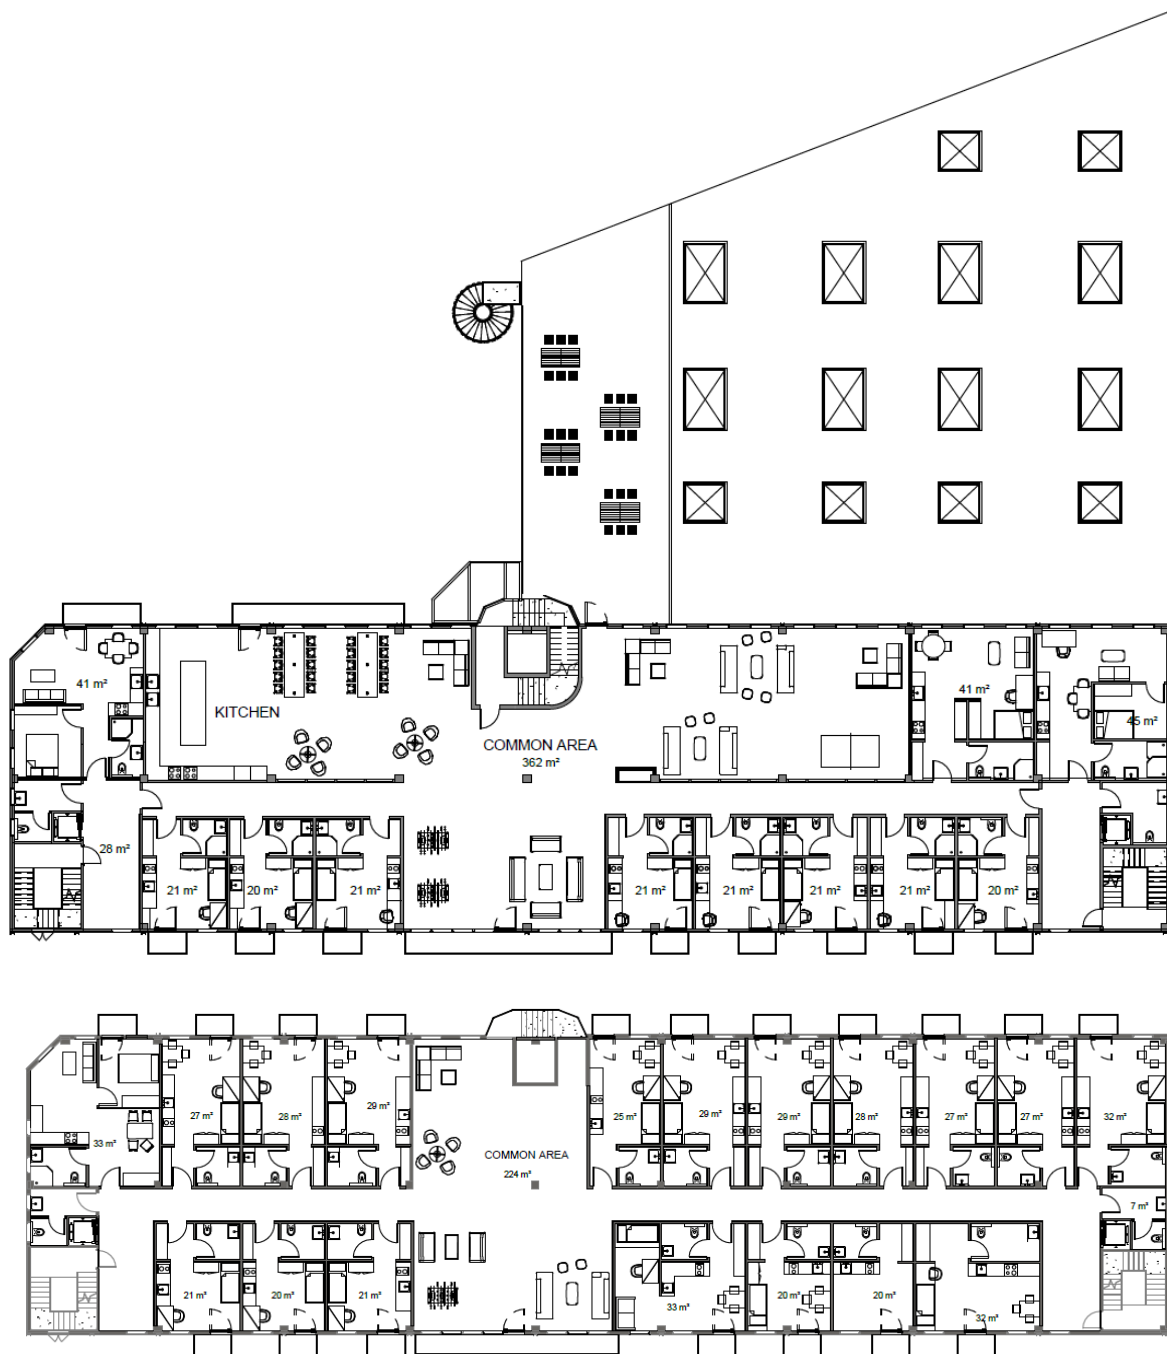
Layout of the first and second floor of the transformed building containing student apartments.
